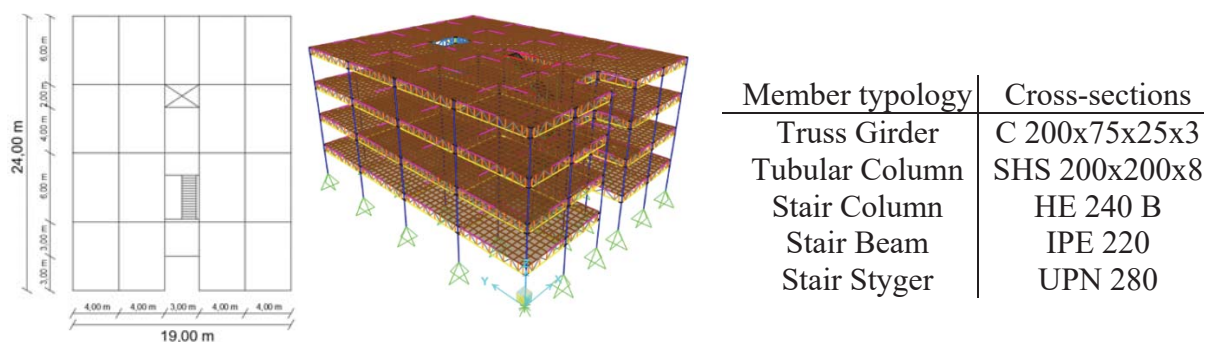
Plan, 3D view and cross-sections for SC1 and SC2
